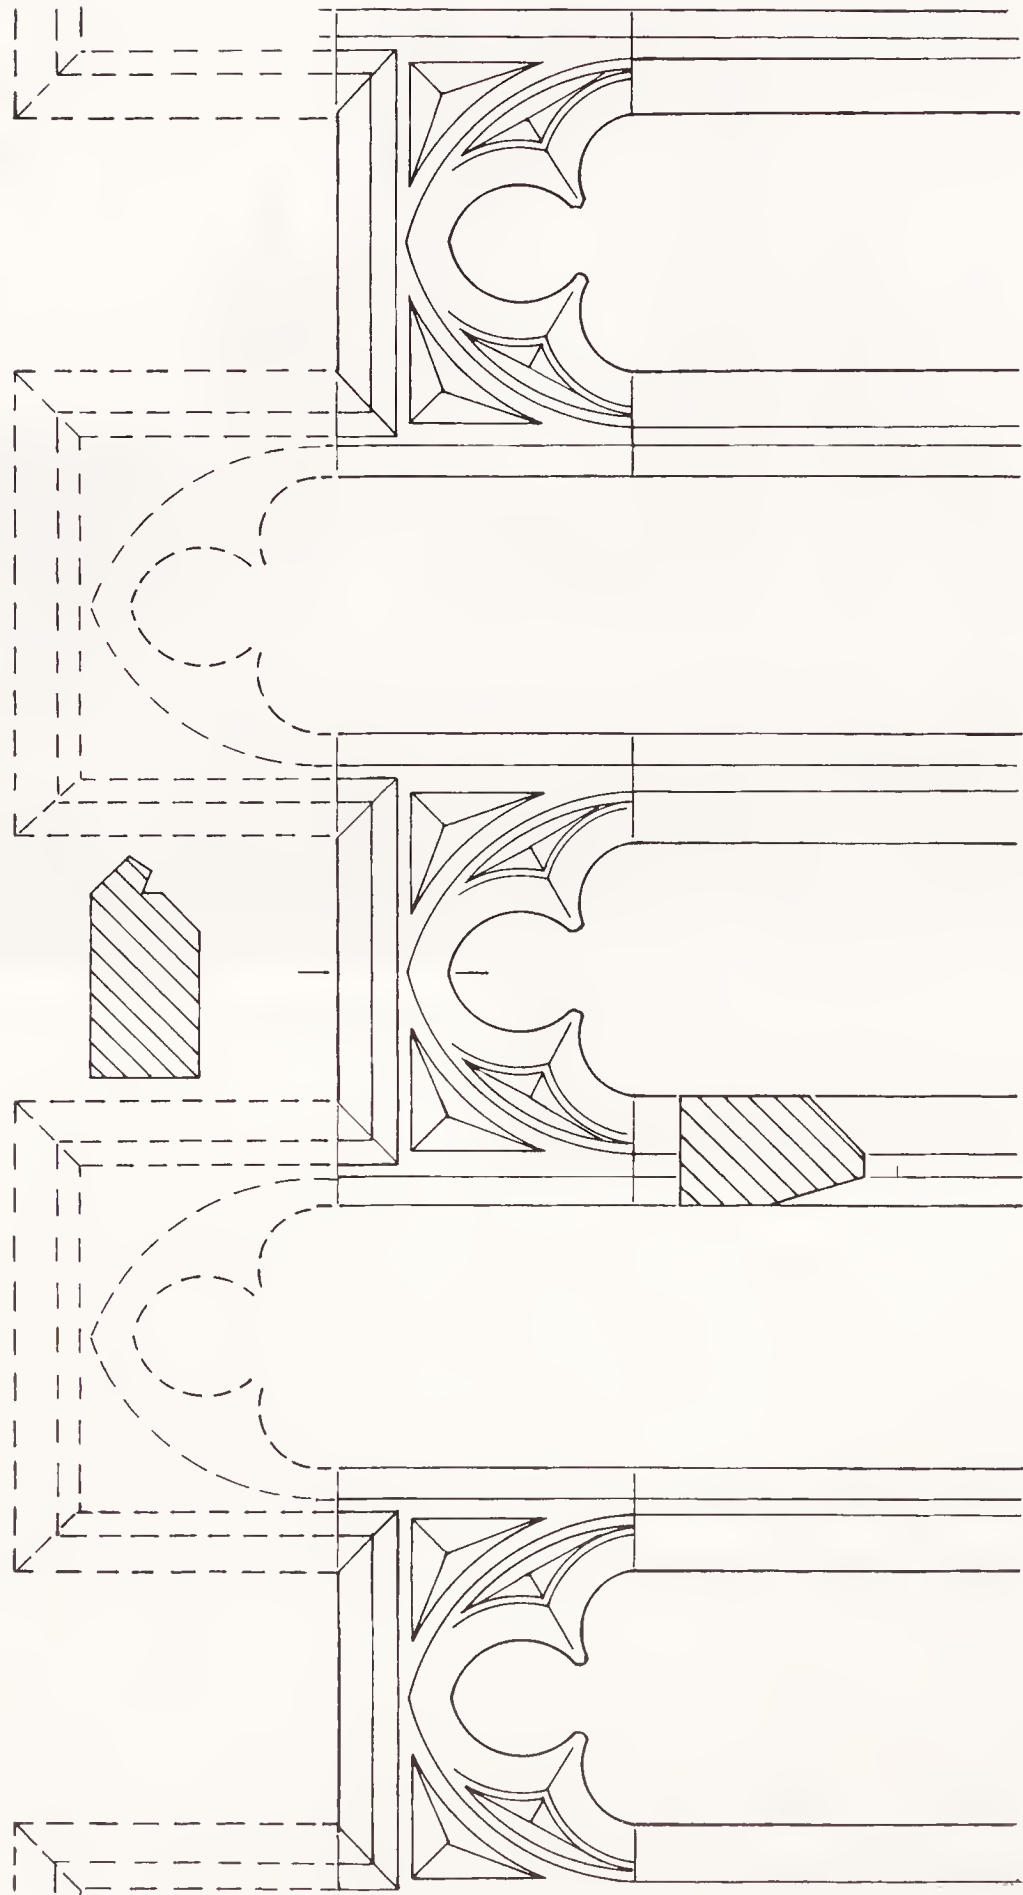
Reconstructed drawing of the arcaded parapet with pierced cusped openings.
